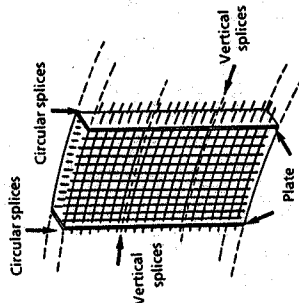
Reinforcement Splices of Earth Retaining Wall Segment
